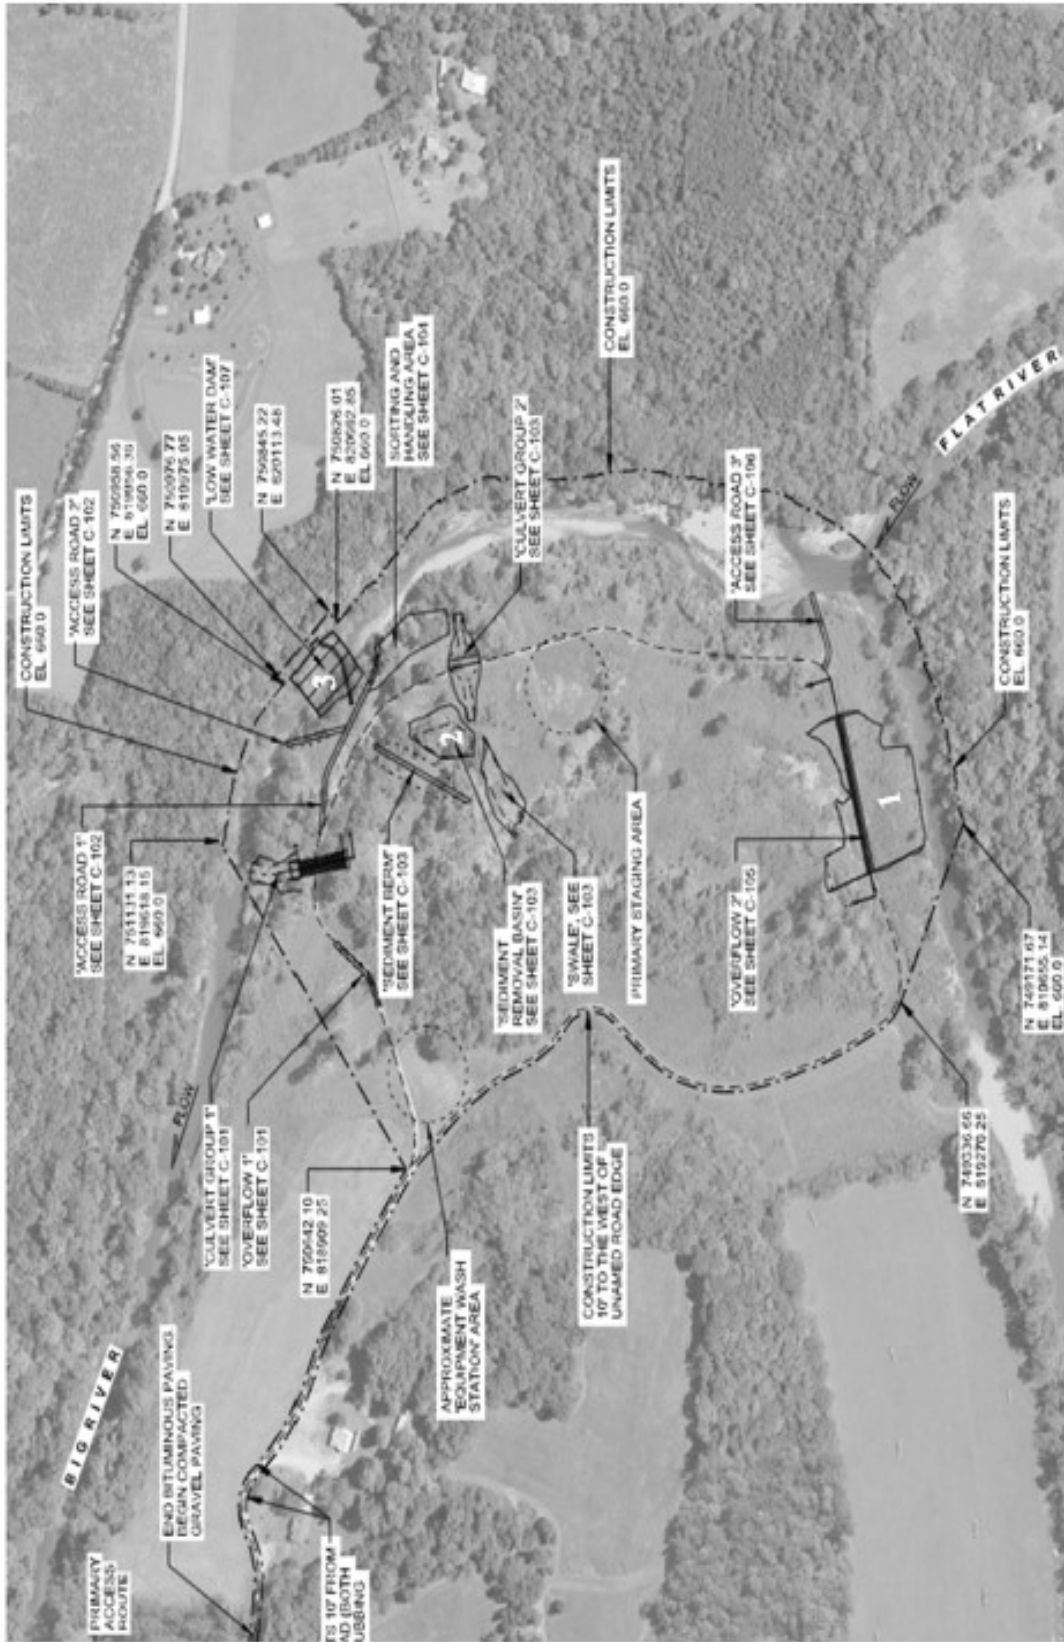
BRLRS site construction plans (Designed by Joseph Asher Leff, 2014).
